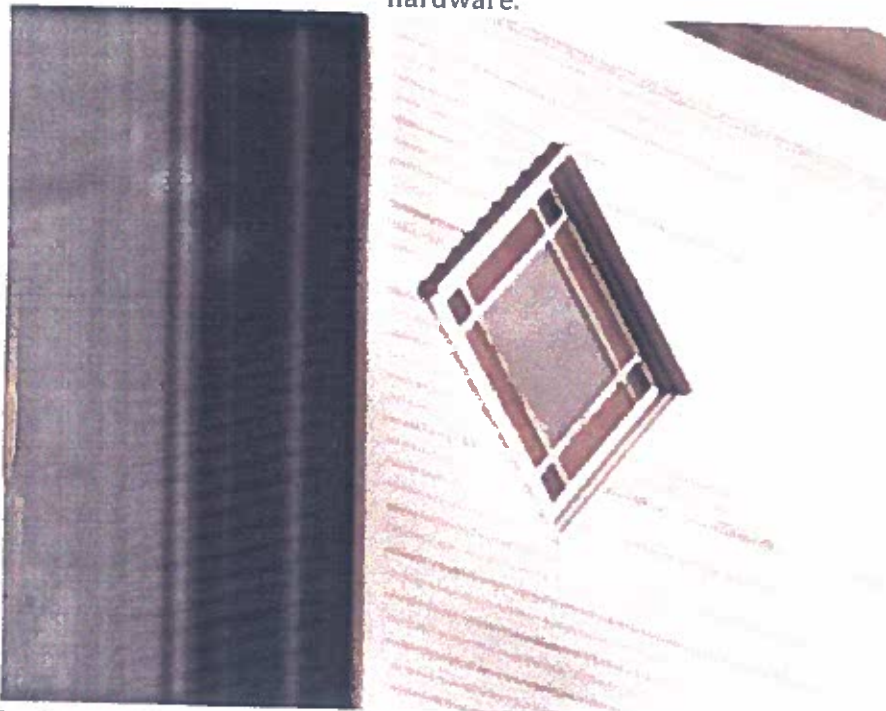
2<sup>nd</sup> floor diamond shape window to the northwest room. This floor is not designed to be opened.
